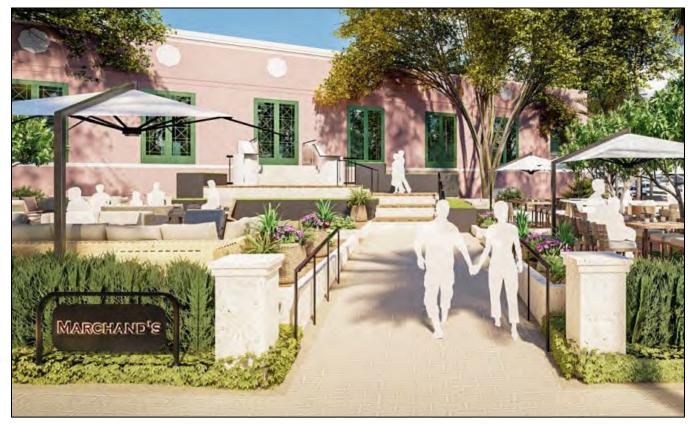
Rendering of new entrance to Marchand's in the east wing of the building.
